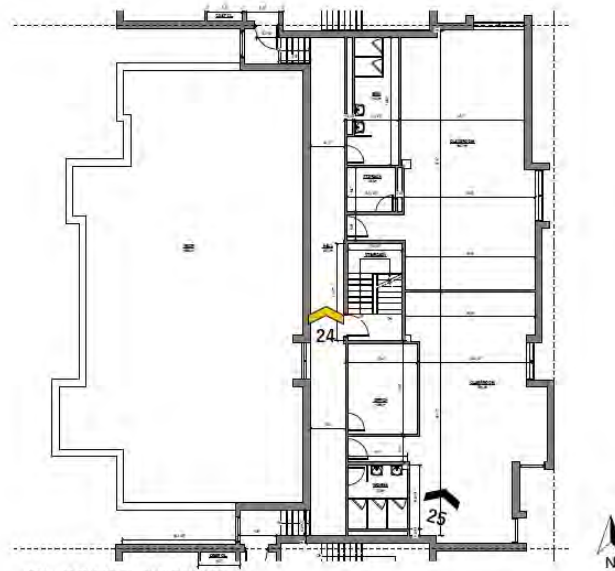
Block 2 - 212 Stuyvesant Avenue Photo Key Plan, Second Floor
